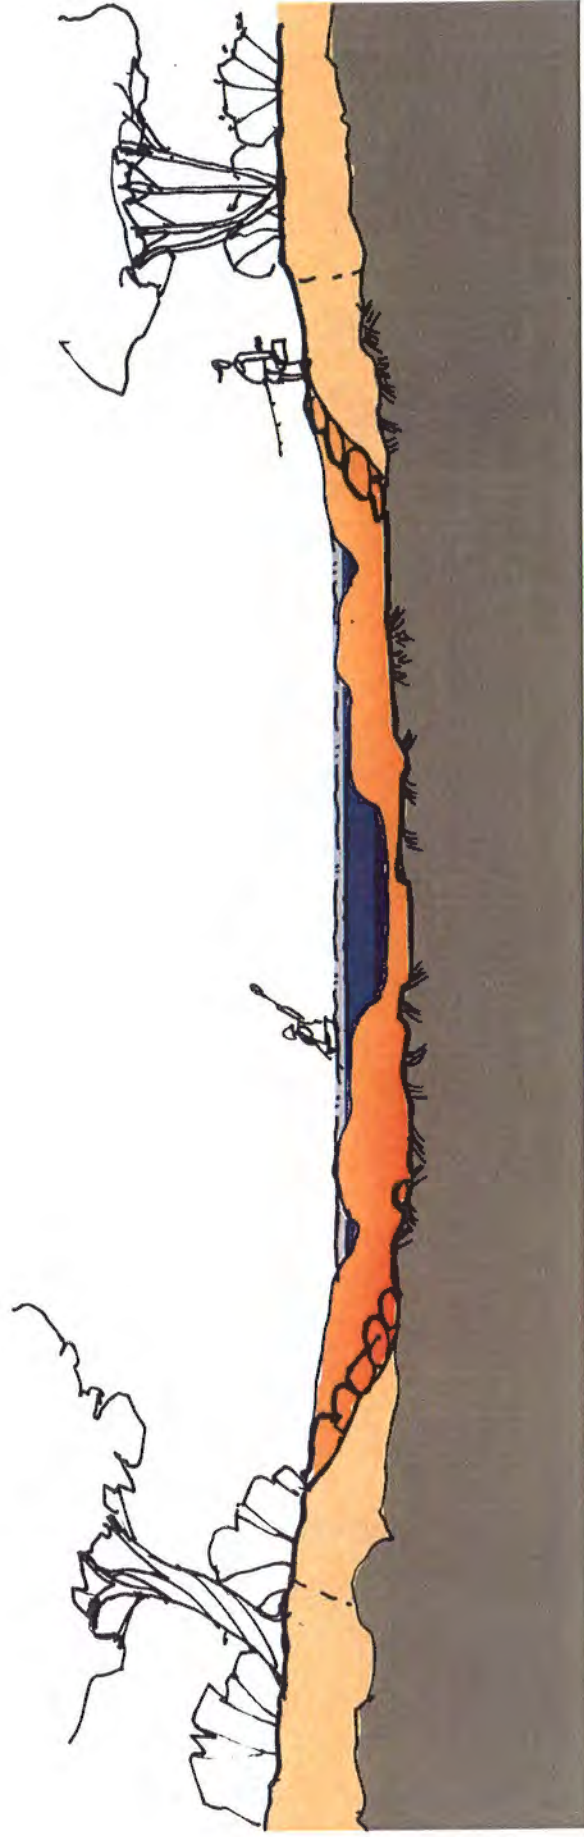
~ ELEVATION OF TYPICAL DROP
